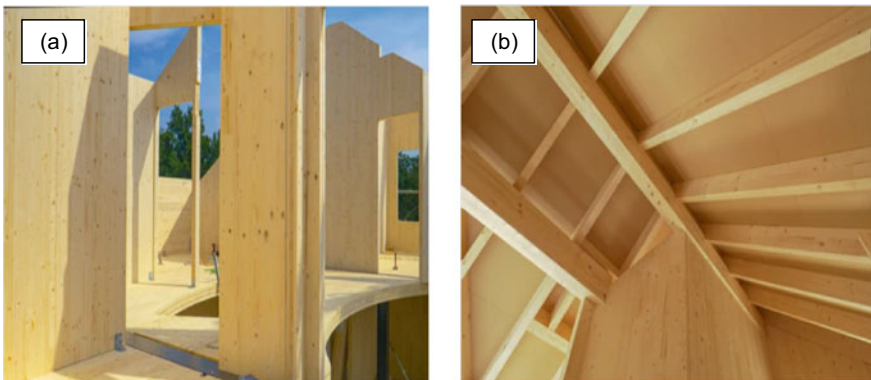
Structural floor and wall structures (a) and structural roof truss made from CLT panels (b)
